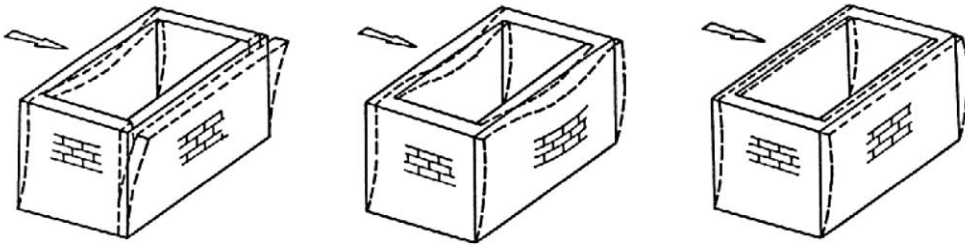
Response of simple masonry building to horizontal actions: building with deformable floors without ties (left), building with deformable floors and tied walls (middle) and building with rigid floors and tie-beams (right) (from Macchi and Magenes, 2002).
